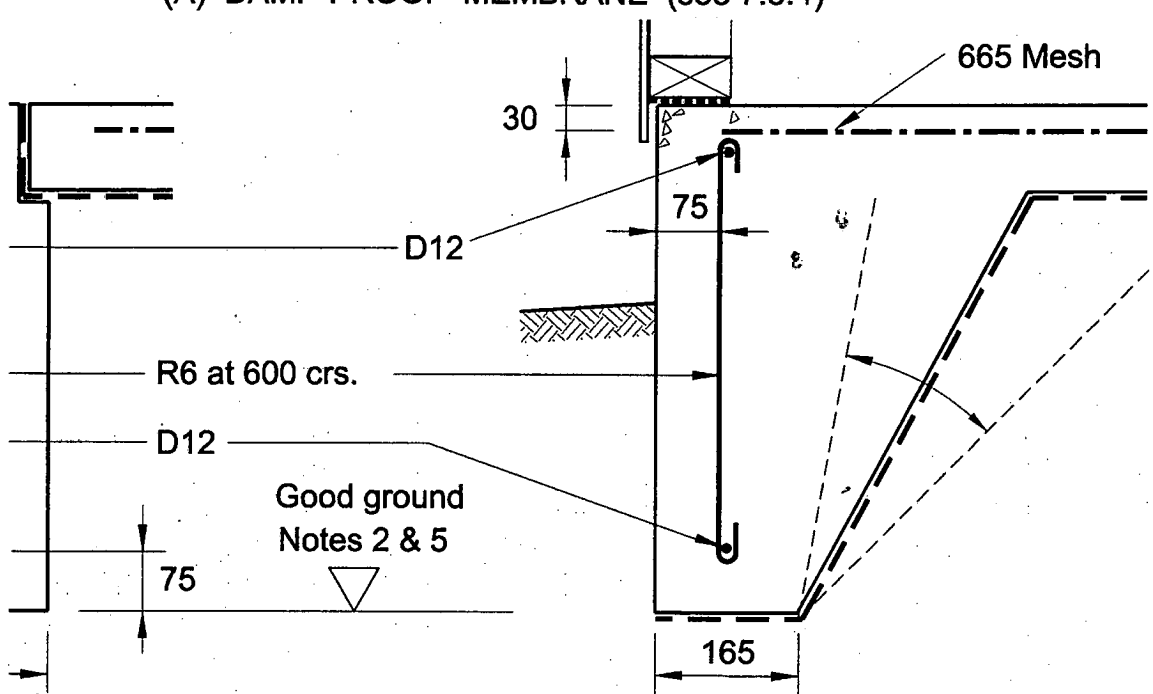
Foundation edge details - *In situ* concrete (see 7.5.2.3)
